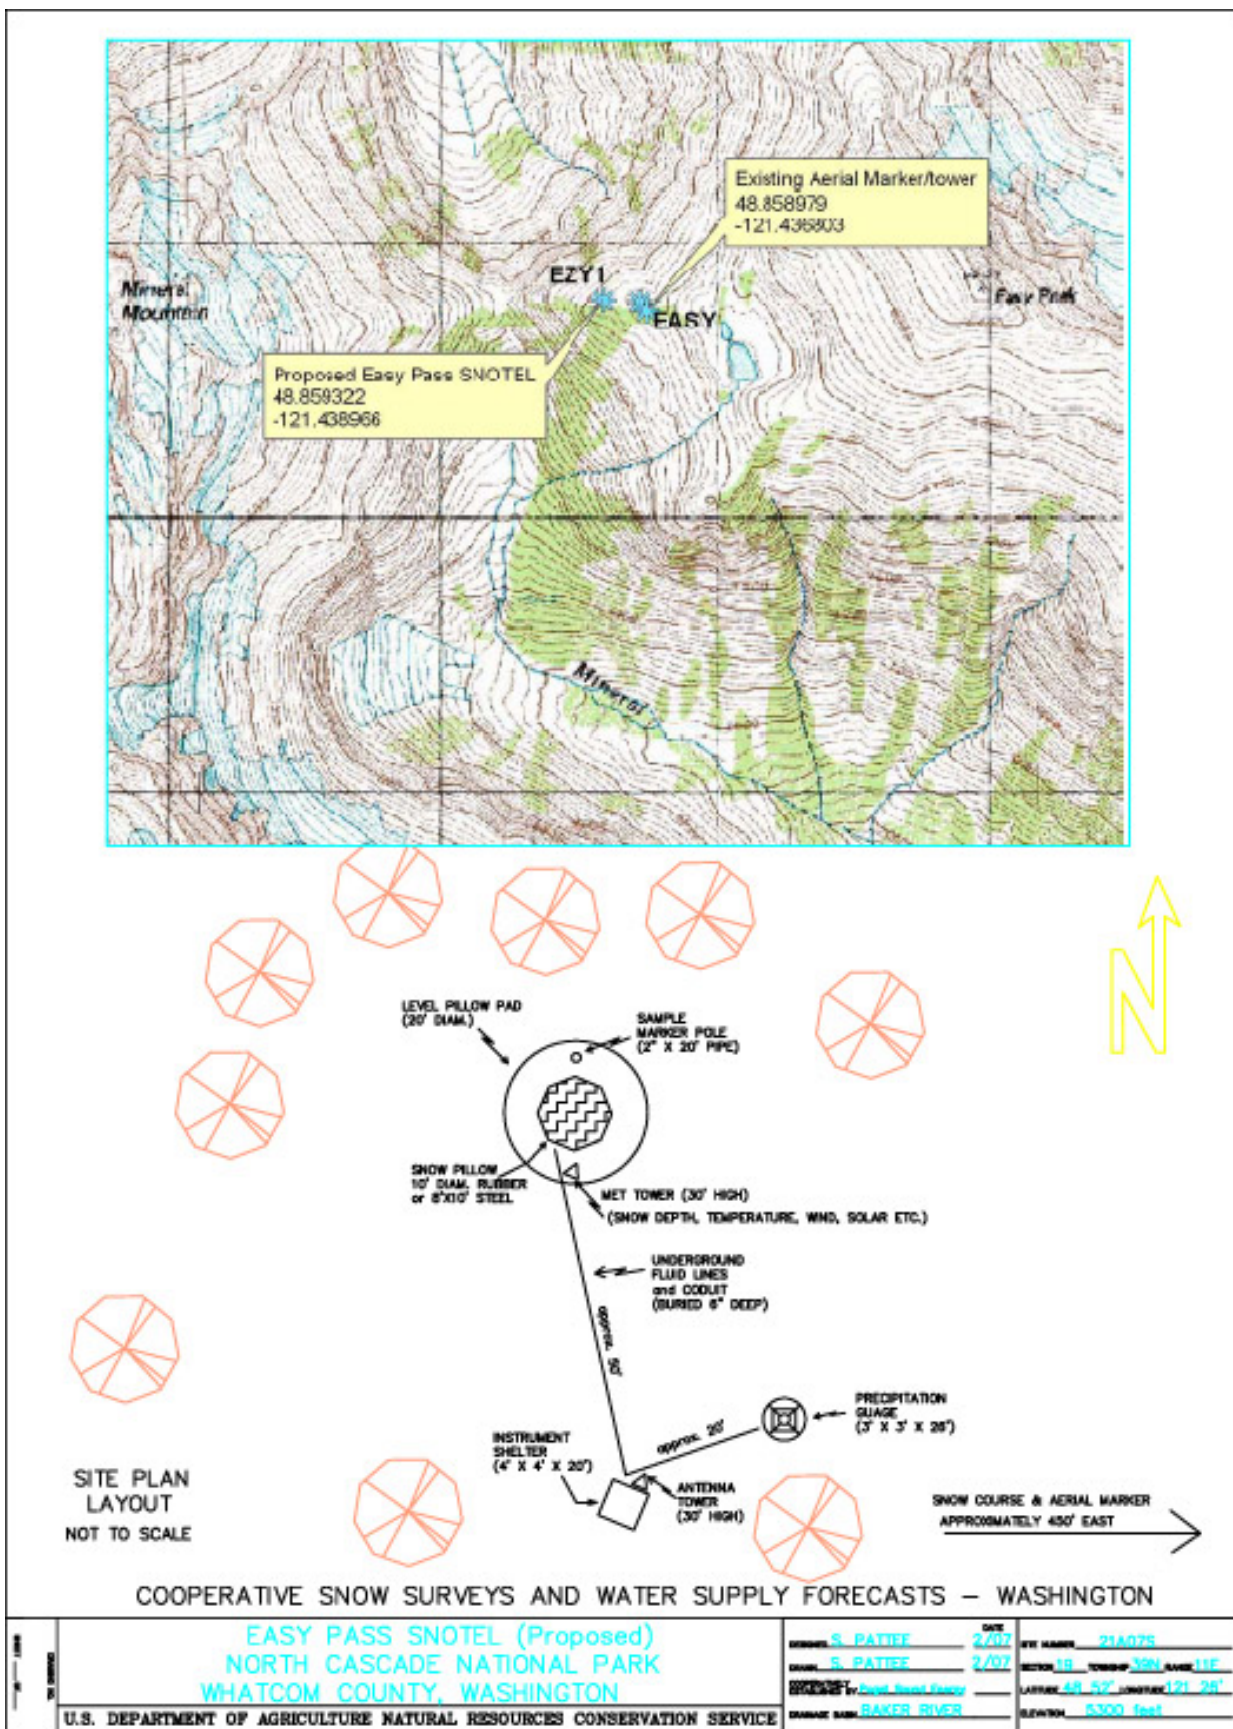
Site Layout of Proposed Easy Pass SNOTEL
